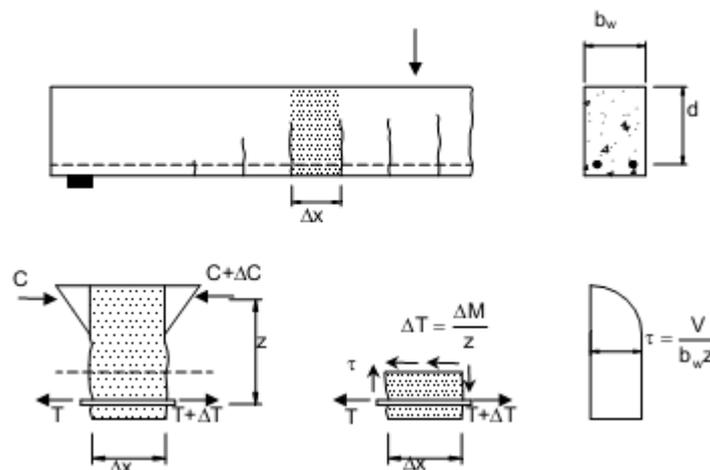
Shear stress distribution in a reinforced concrete beam with flexural cracks (adapted from Collins and Mitchell, 1997).
